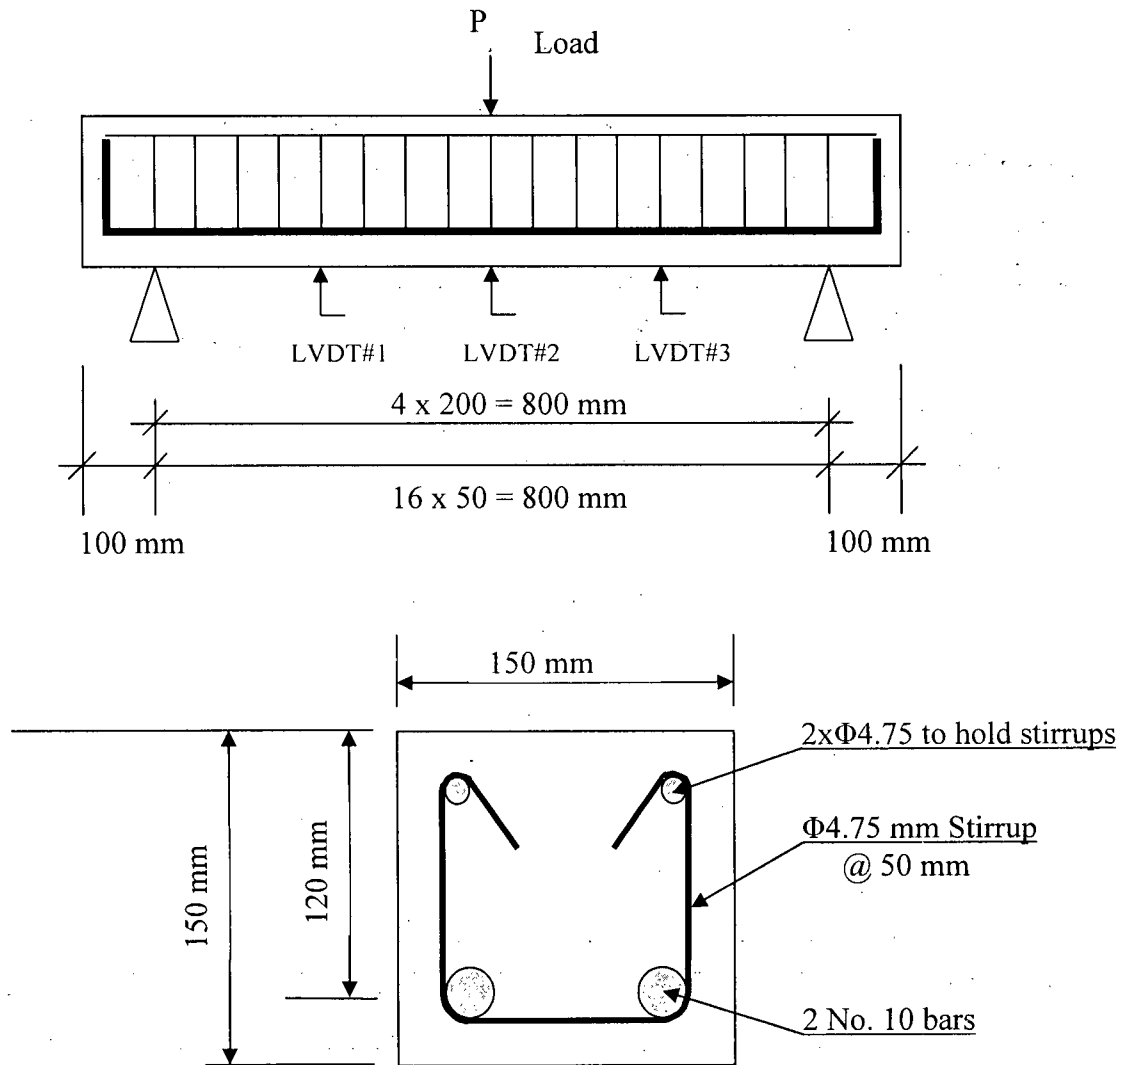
Load Configuration and Cross-Sectional Details of RC Beams
